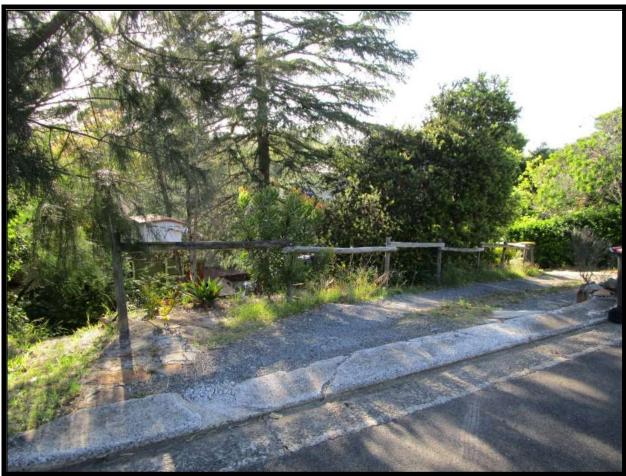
Front Site Photo Looking from Woronora Parade - 87 Woronora Parade, Oatley
